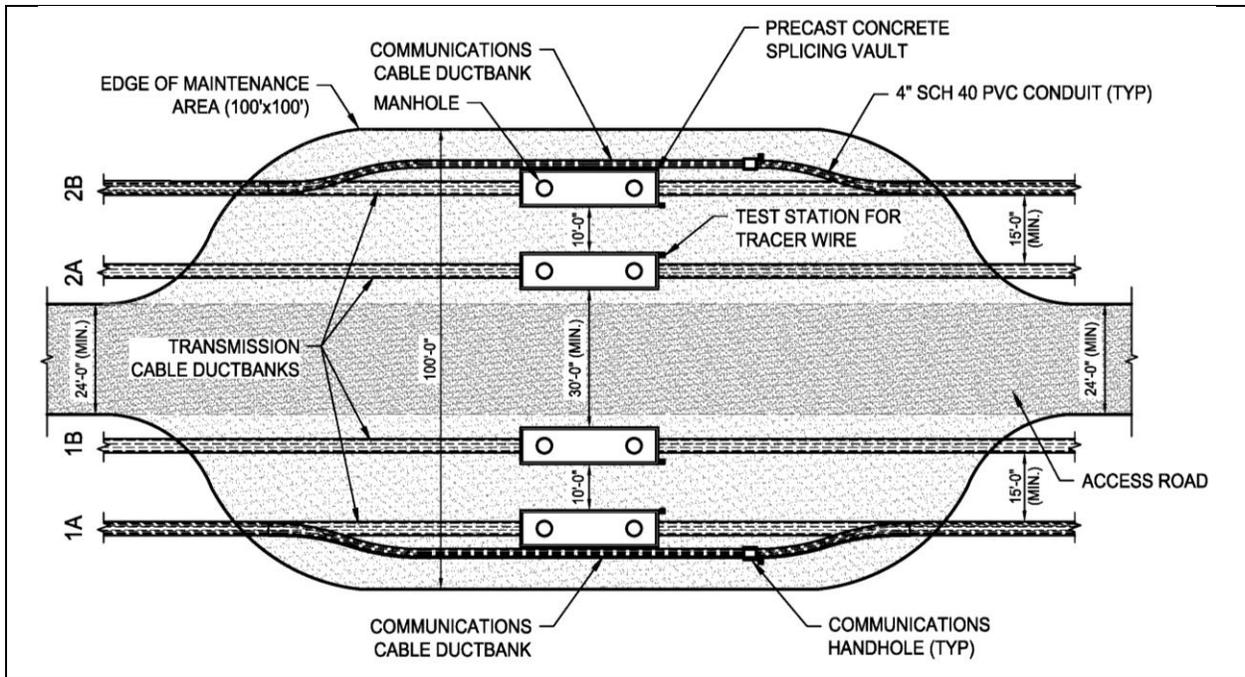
Typical Underground Ductbank and Vault Arrangement
